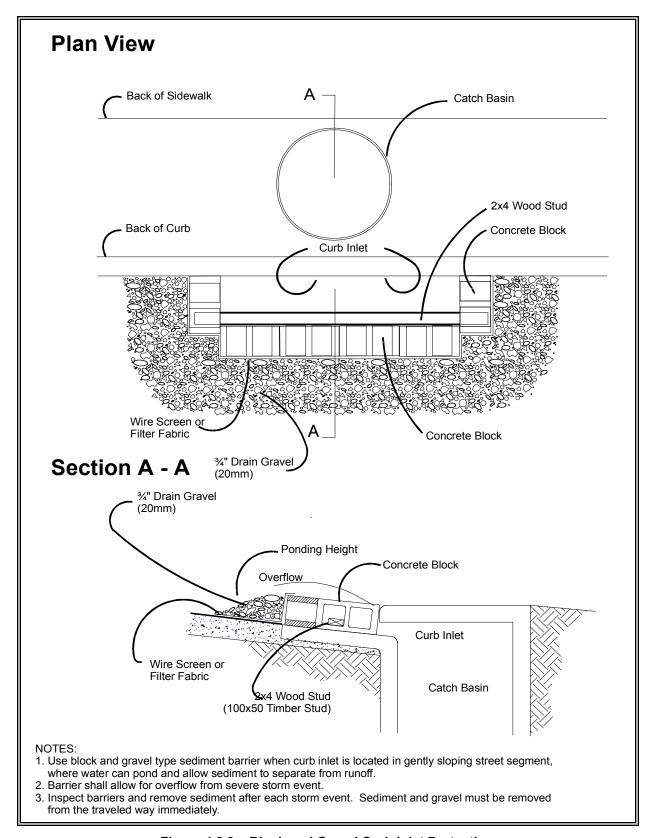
Block and Gravel Curb Inlet Protection
